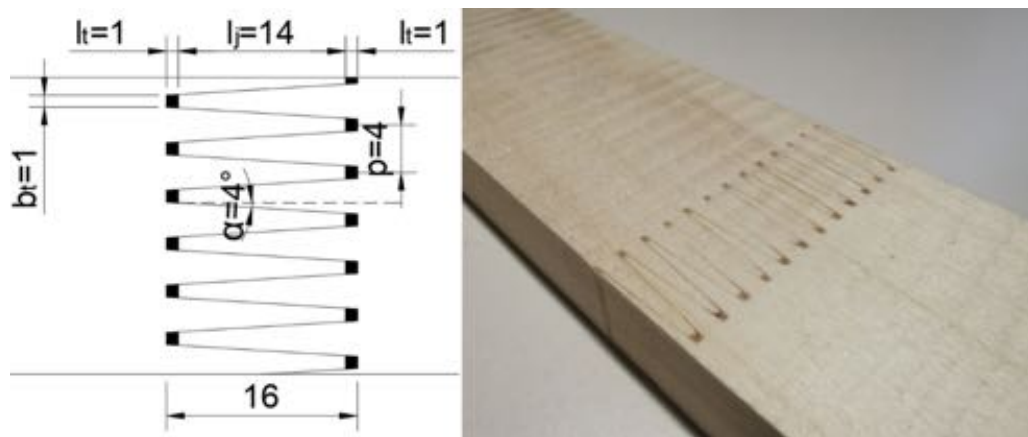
Geometrical parameters of the finger joint profile and finger joint picture. Dimensions in mm.
